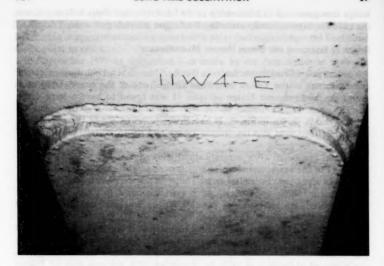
Cover Plate End Showing Fatigue Crack at Weld Toe
